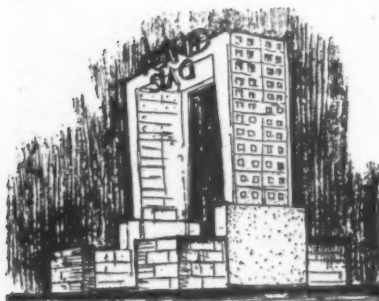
J. A. King's standard lantern light in precast concrete units (Stand F 118).
